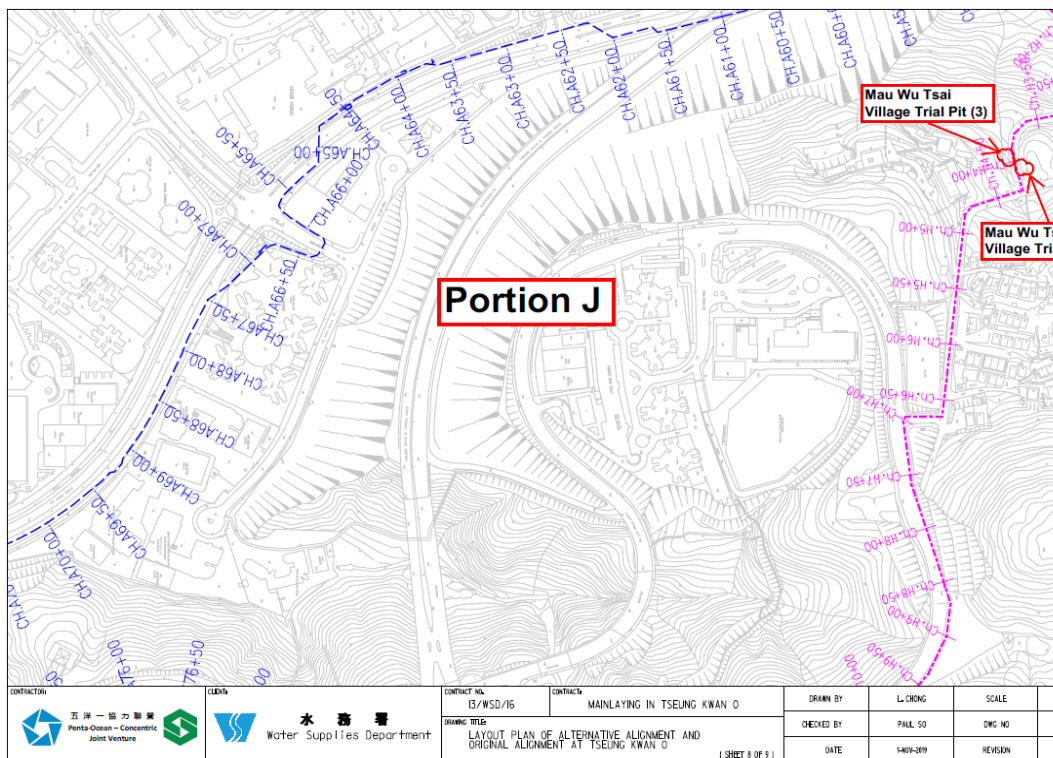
Location Plan for Mau Wu Tsai 2 & 3
